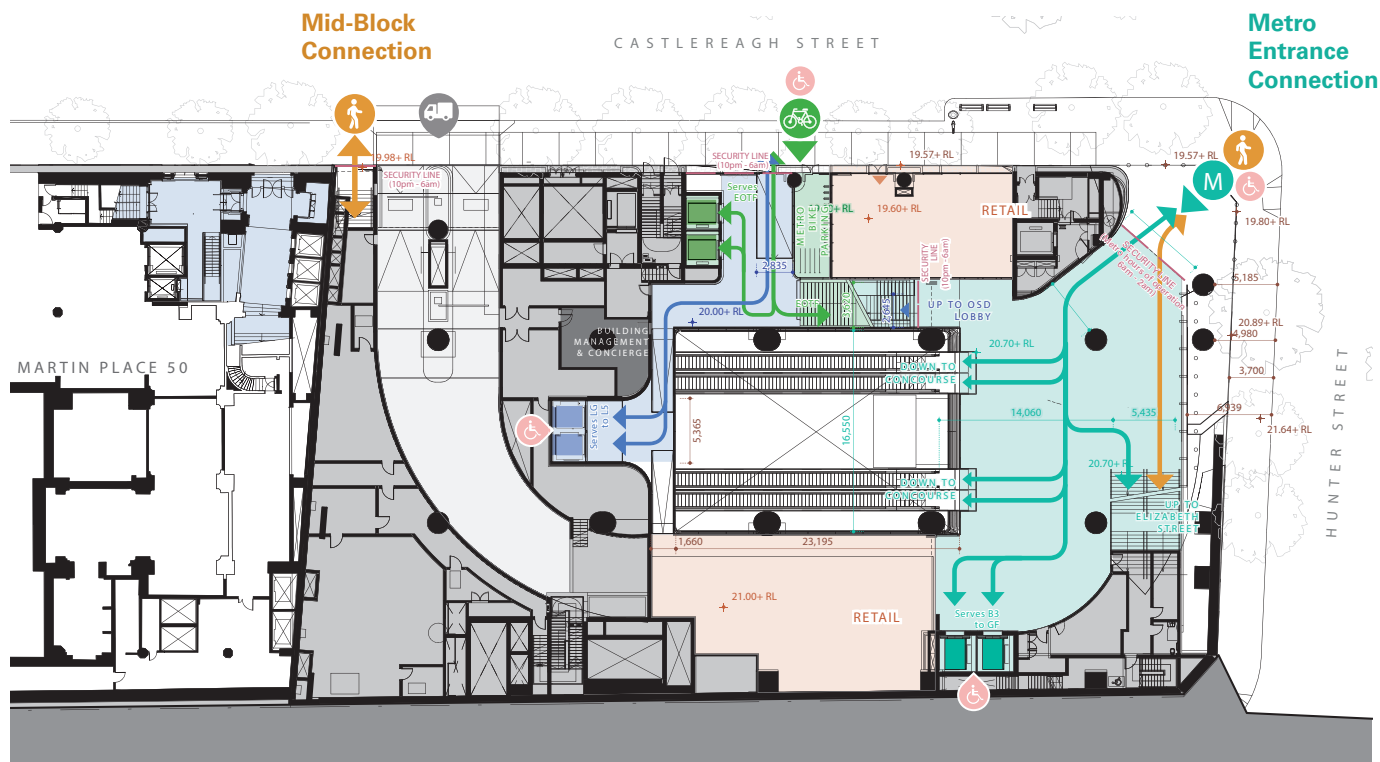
Lower Ground Floor Plan - Castlereagh Street by Grimshaw
